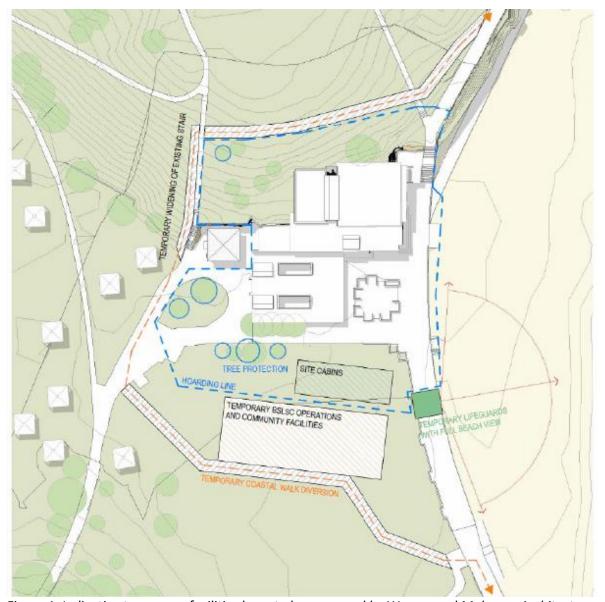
Indicative temporary facilities layout plan prepared by Warren and Mahoney Architects
